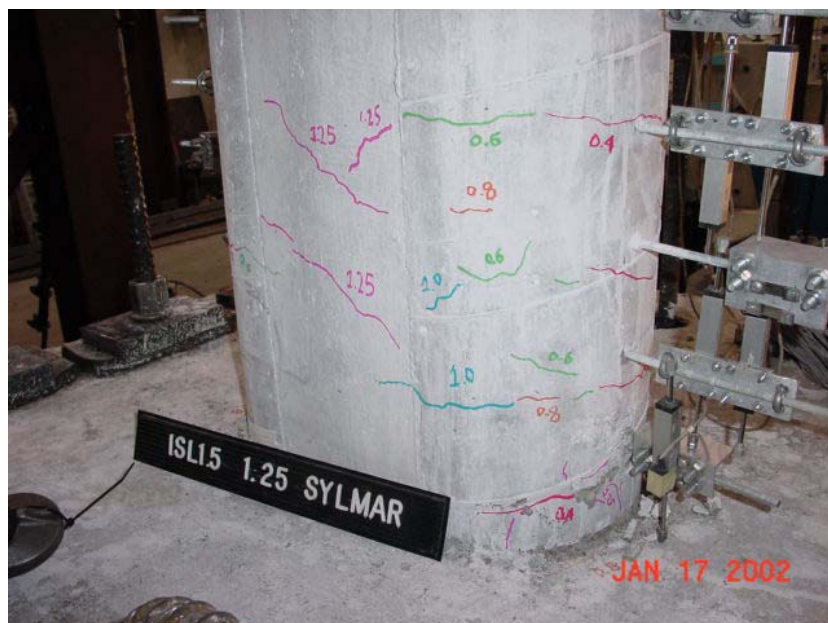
Shear Cracks ($\mu_d = 2.4$) Specimen ISL1.5
